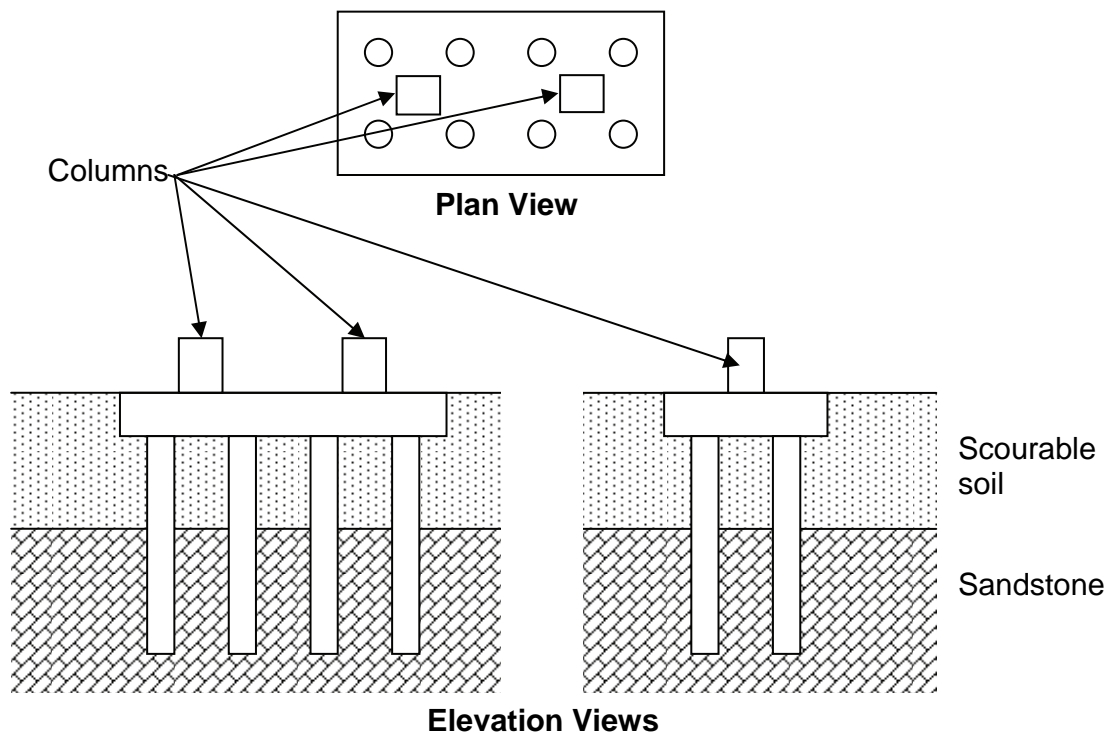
Example of a Drilled Shaft Group Foundation for a Bridge
